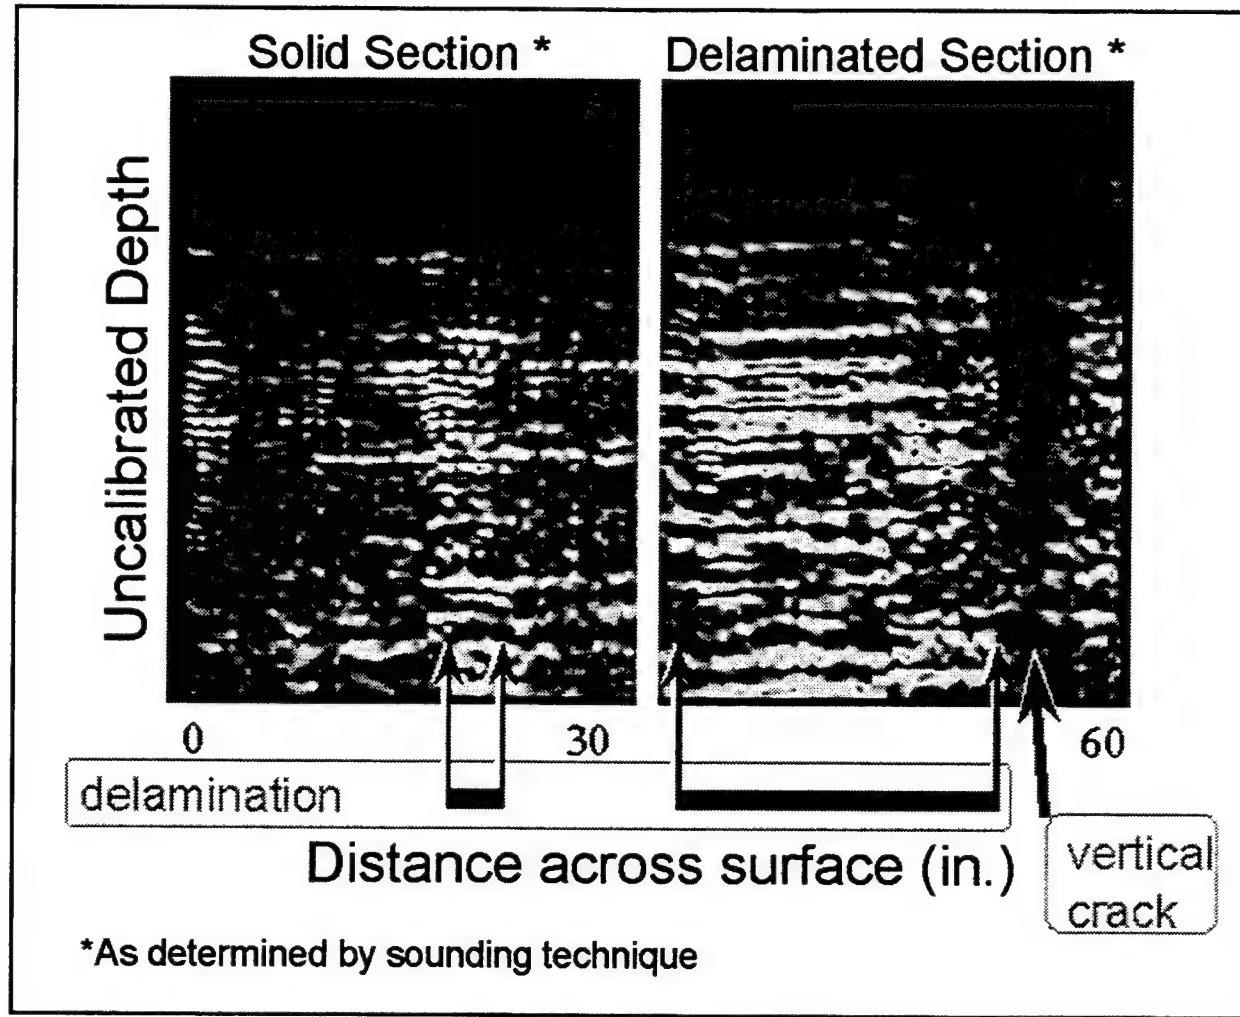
Delamination detection in a concrete bridge deck with a tined concrete overlay
